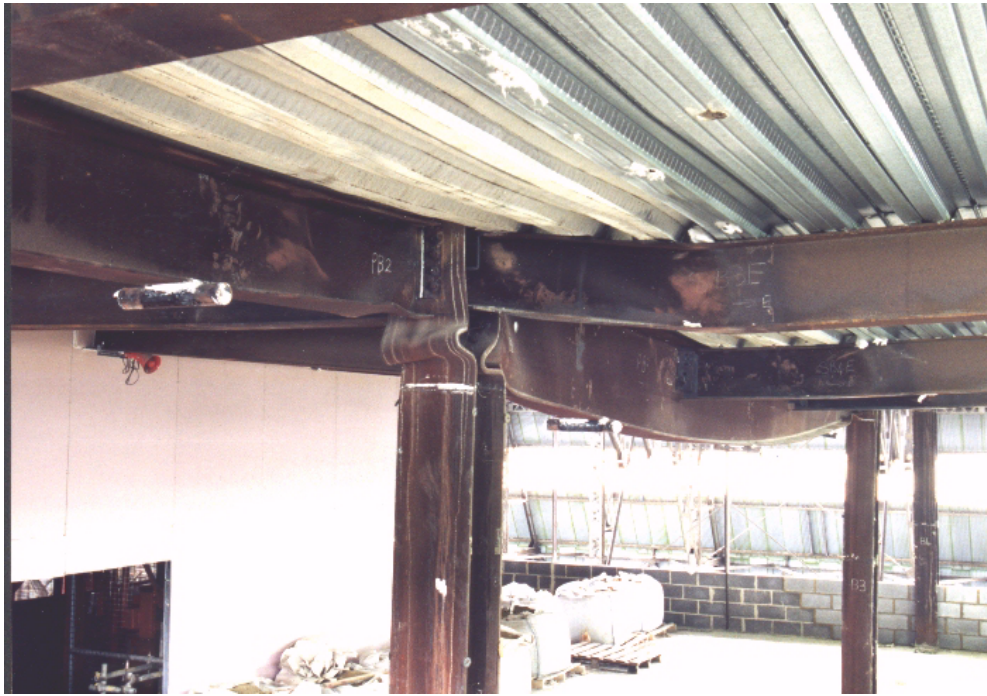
Column squashing in British Steel Test 2: Plane frame test
